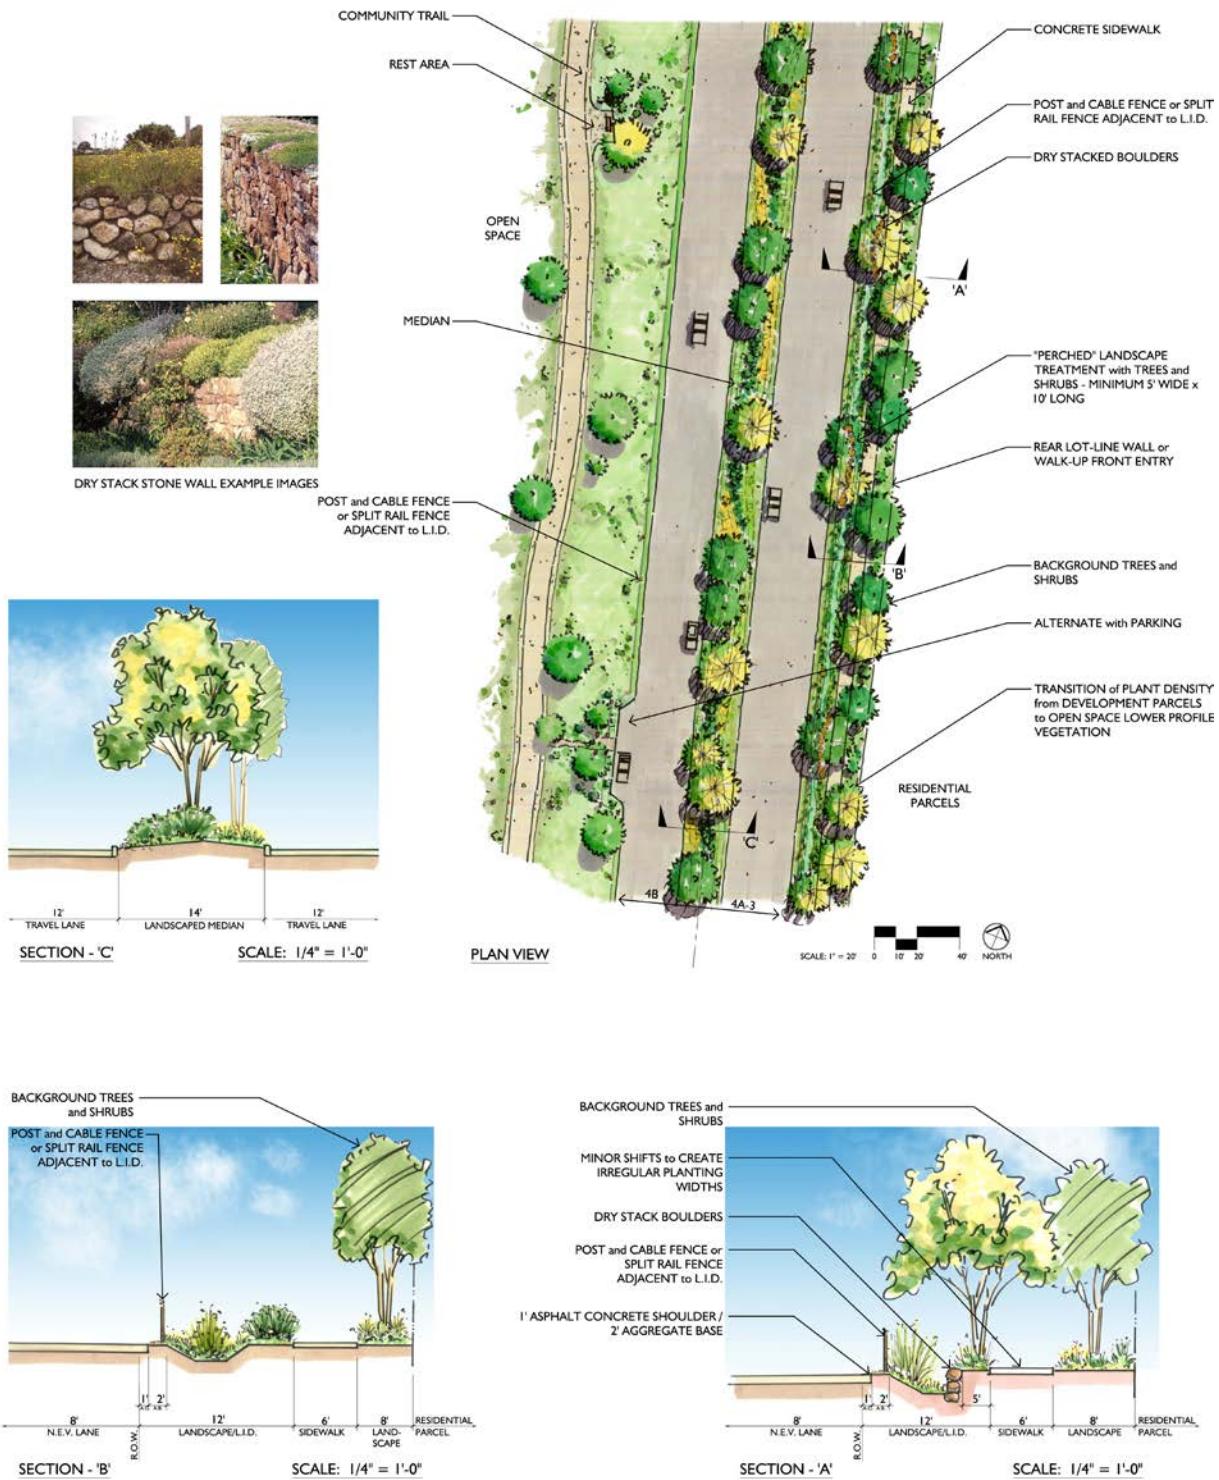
(b): Streetscape Concepts for Street Sections 4B and 4A-3
